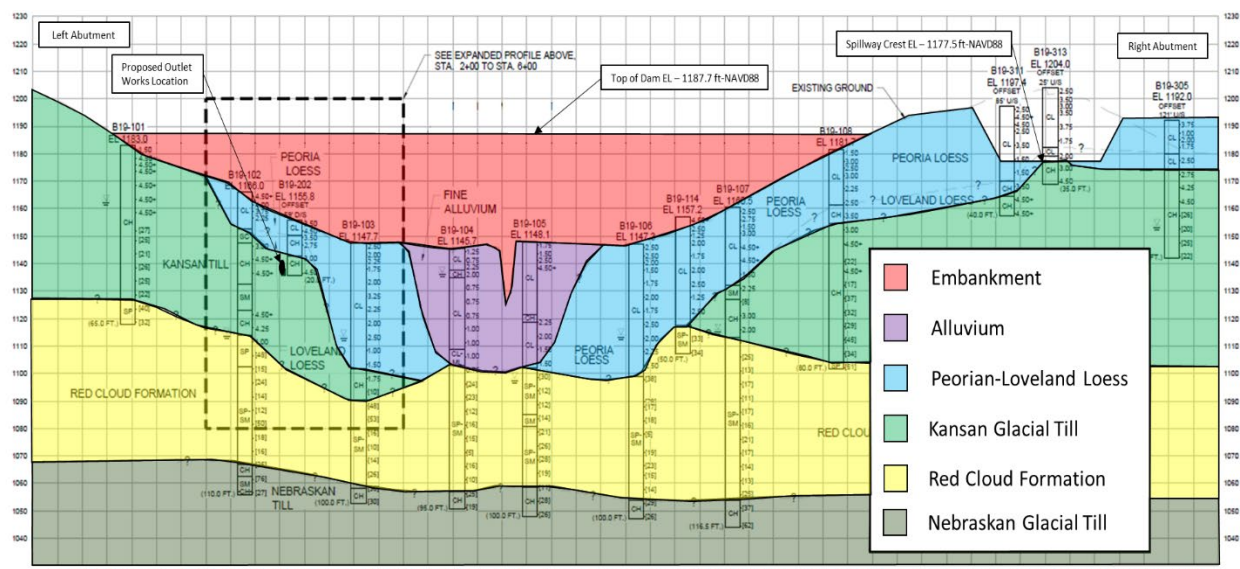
DS19 Geologic Section of the Spillway and Dam Embankment
